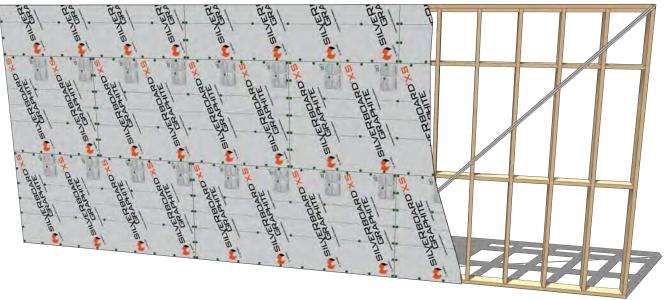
Horizontal SilveRboard installation over open stud wall assembly
